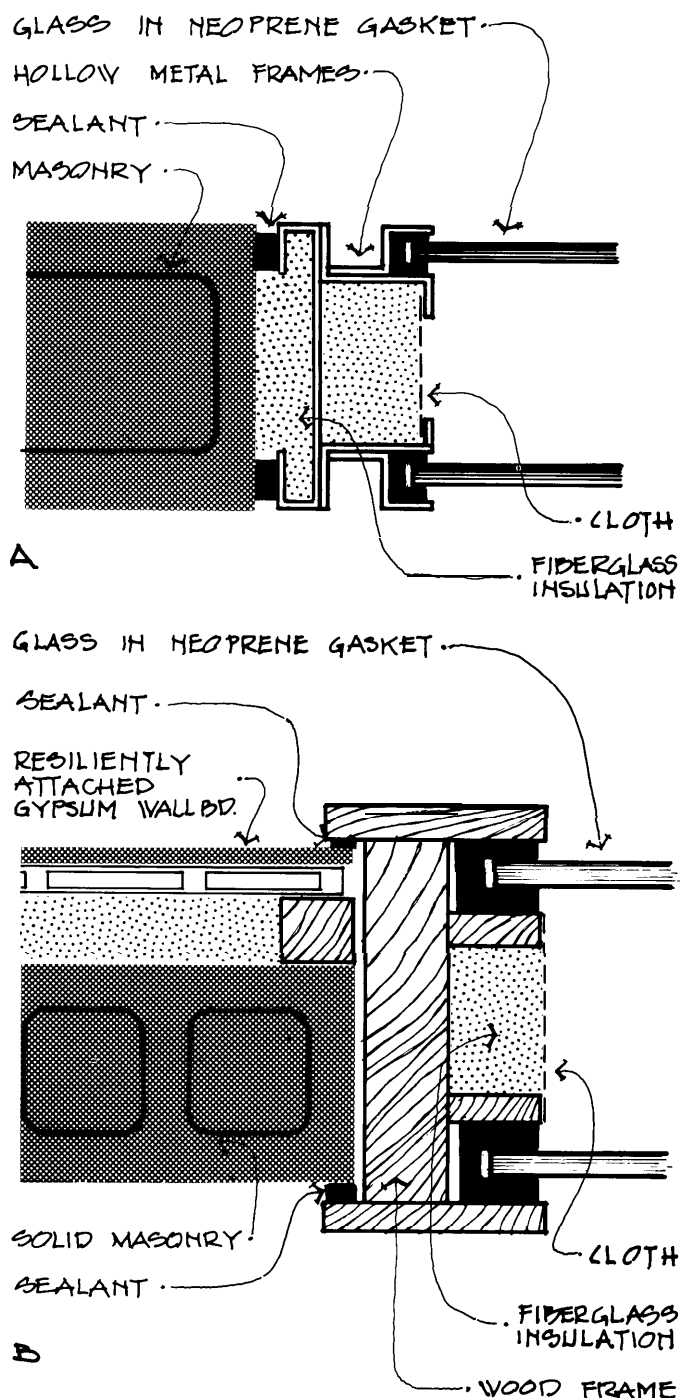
Window Frame Details - Alternative Methods of Constructing Double-Glazed Windows for Sound Isolation
